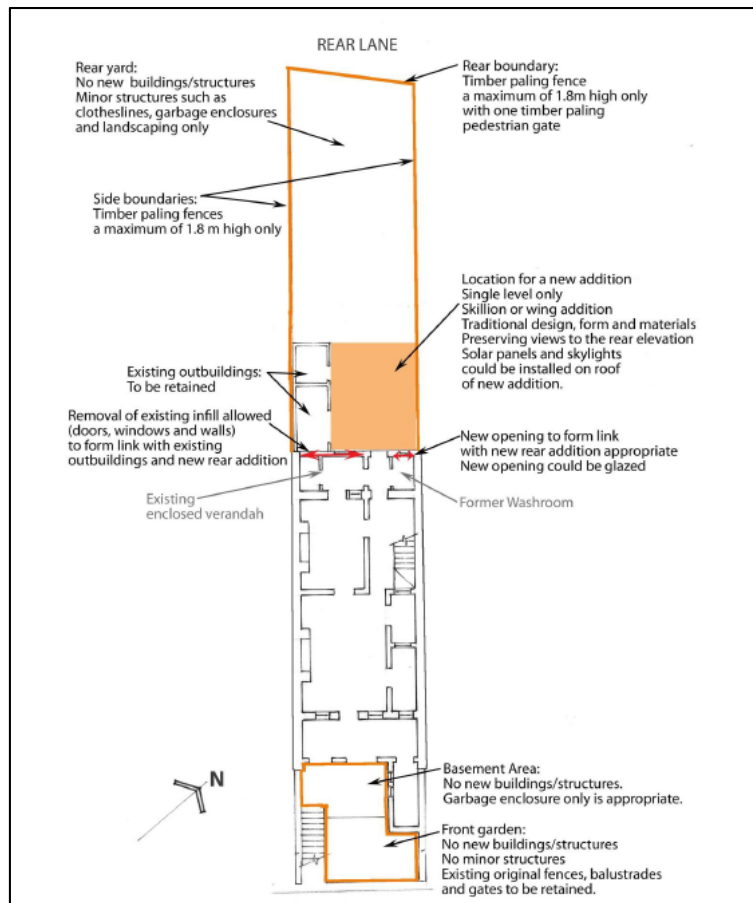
Plan from endorsed Conservation Management Plan for Millers Point terrace showing possible locations for new additions and openings (Clive Lucas, Stapleton and Partners Pty Ltd, 2014, p.x)
